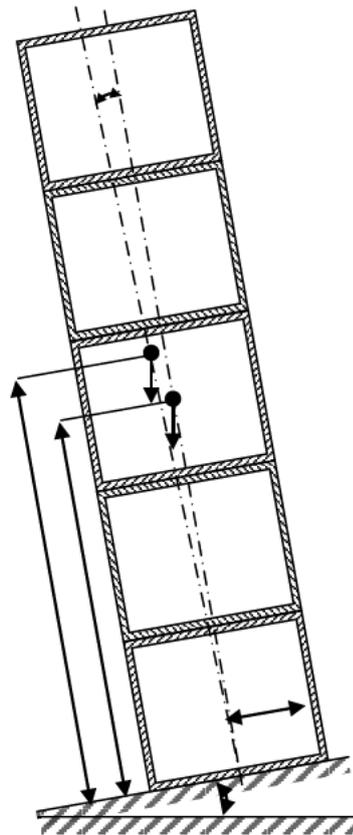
Diagram static stability of multi-tiered barrier barriers block relative to the angle of inclination of the road
